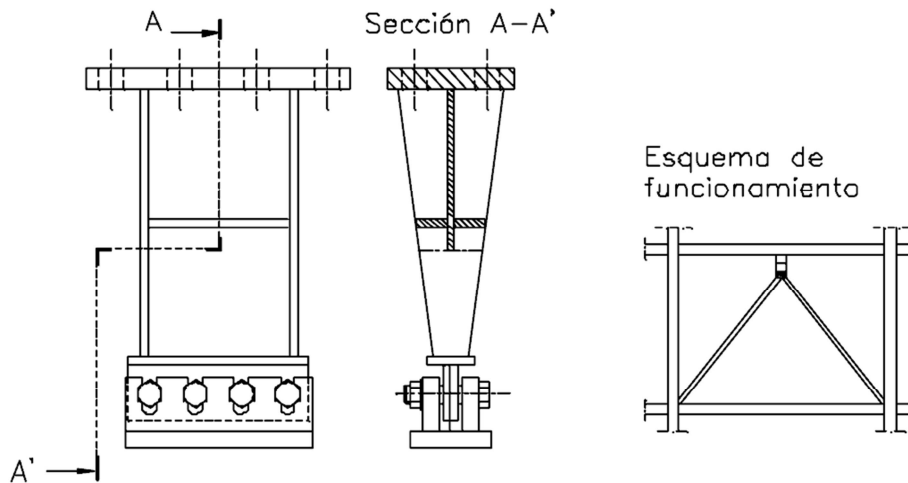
Shear Damper proposed by (Tsai) (Tsai & Wang, 1998)
